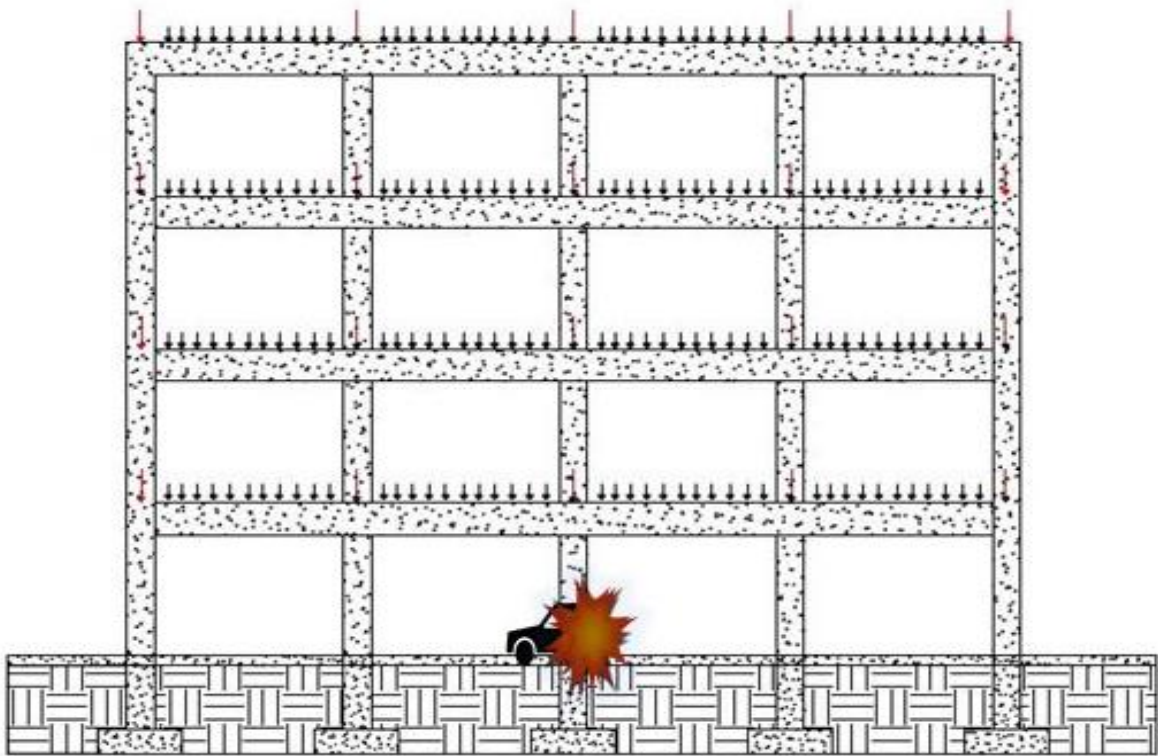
Typical 2-D Concrete Building Frame under Terrorist Attack
